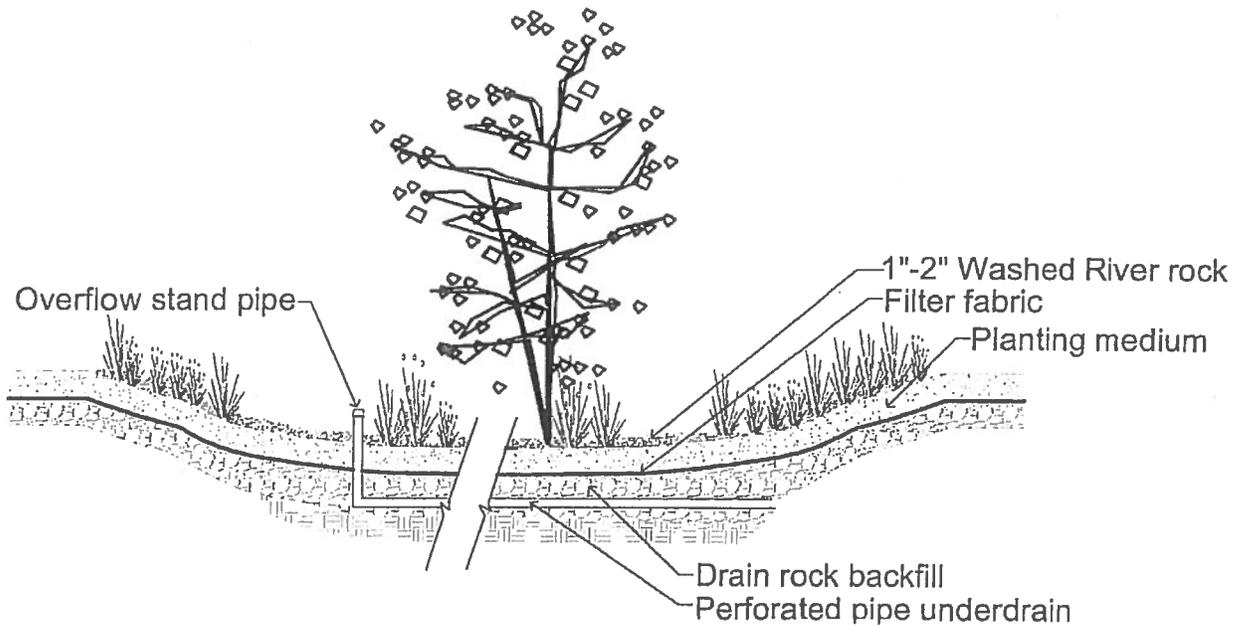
DRY DETENTION SECTION (EXAMPLE)
